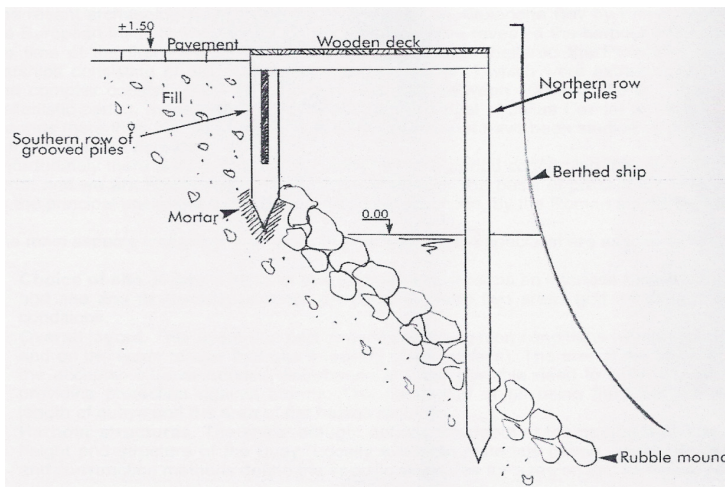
Cross-section of Archaic quay consisting of a wooden deck resting on piles, Alexandria 400 BC [De Grauw 2005]
